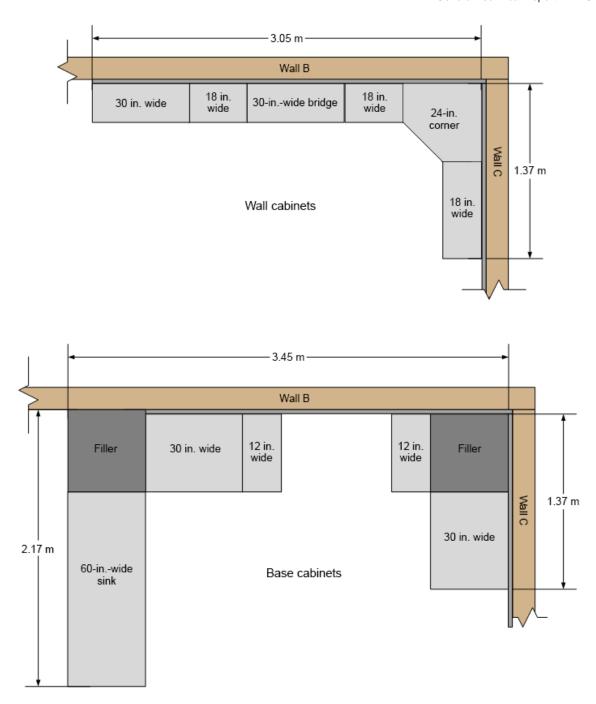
Plan view of wall cabinets and base cabinets in kitchen.
